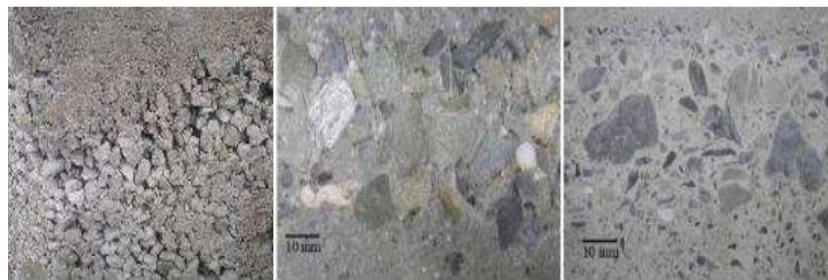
Abrasion Process and Abrasive Damage to the Surface of Hydraulic Concrete
